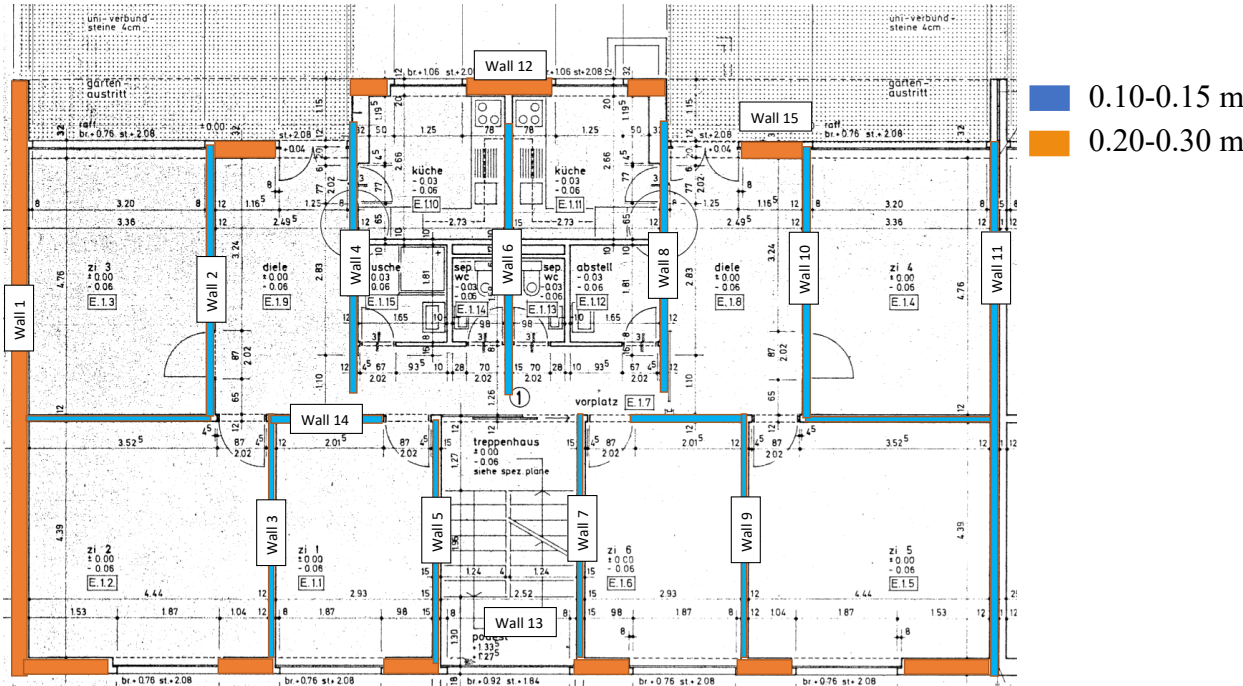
Layout with walls subdivided per thickness (0.10-0.15 m and 0.20-0.30 m)
